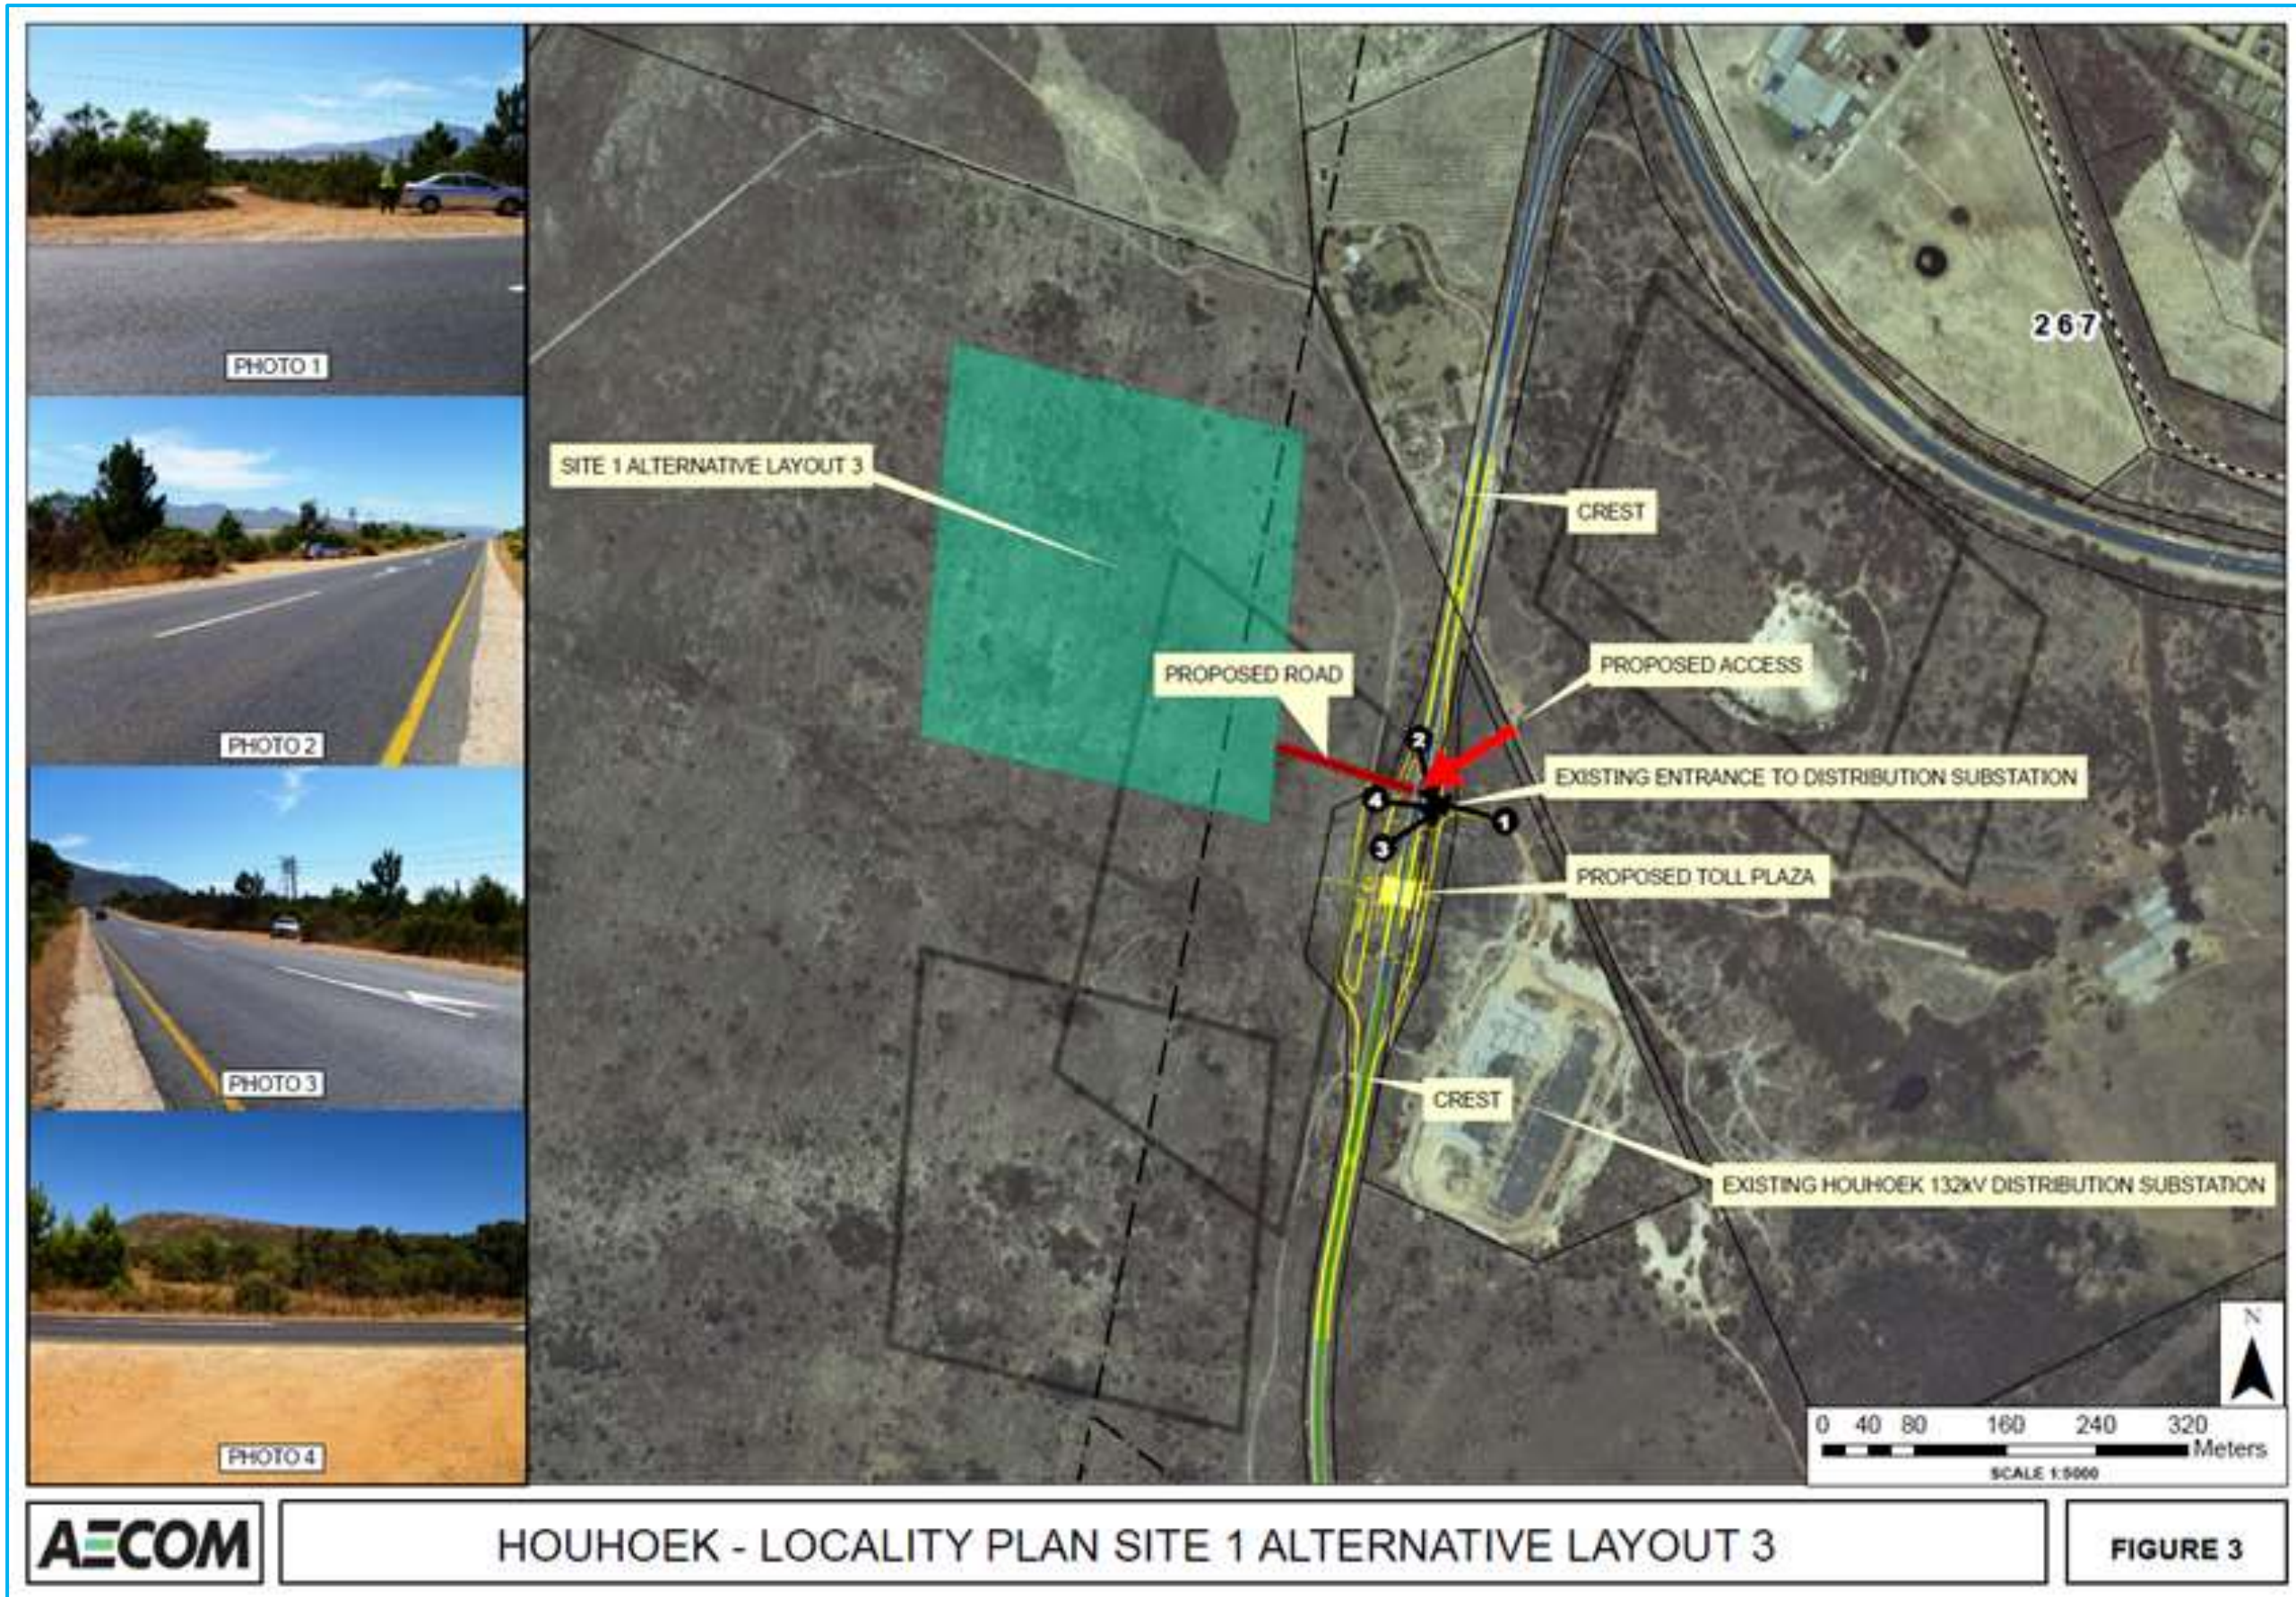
Planned Road Infrastructure Improvements at Site Alternative 1: Layout Alternative 3
